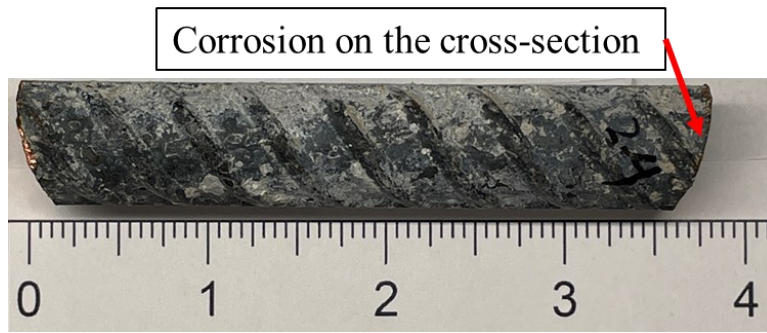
Extracted Black Rebar from Concrete Core Specimens (Cont.).
